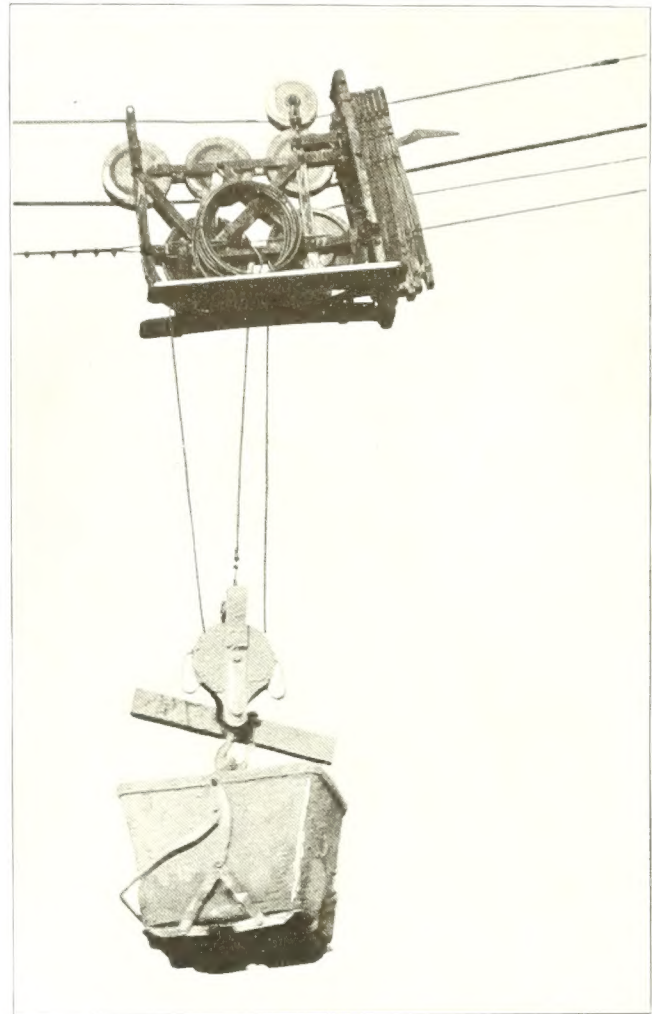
CABLEWAY CARRIAGE AND BUCKET
